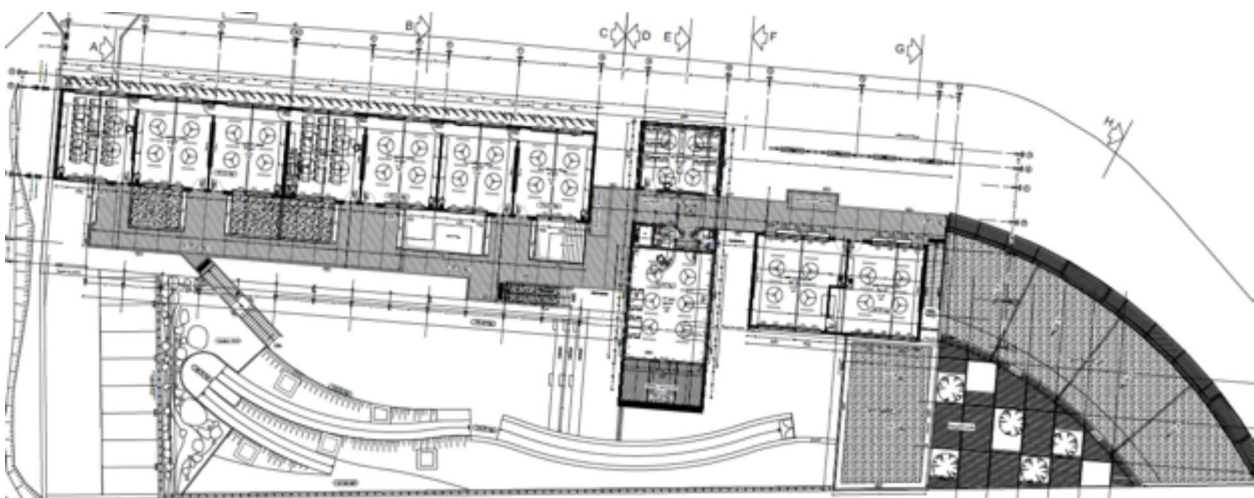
Floor plan of the second floor of the school. © Antoine Perrau Architecture.
